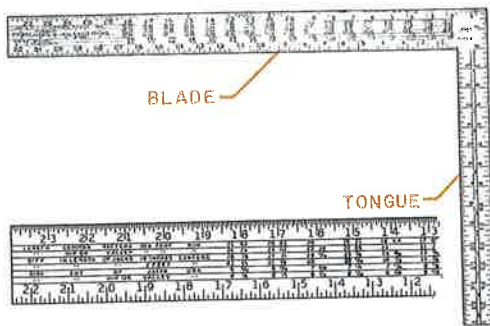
Carpenter's steel square. Notice a section of the roofing table which appears on the blade.
